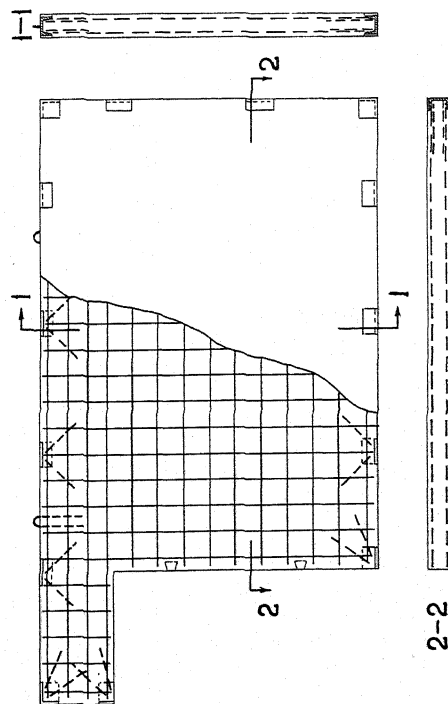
, b Design of a reinforced concrete panel for the internal wall (mesh reinforcing)
